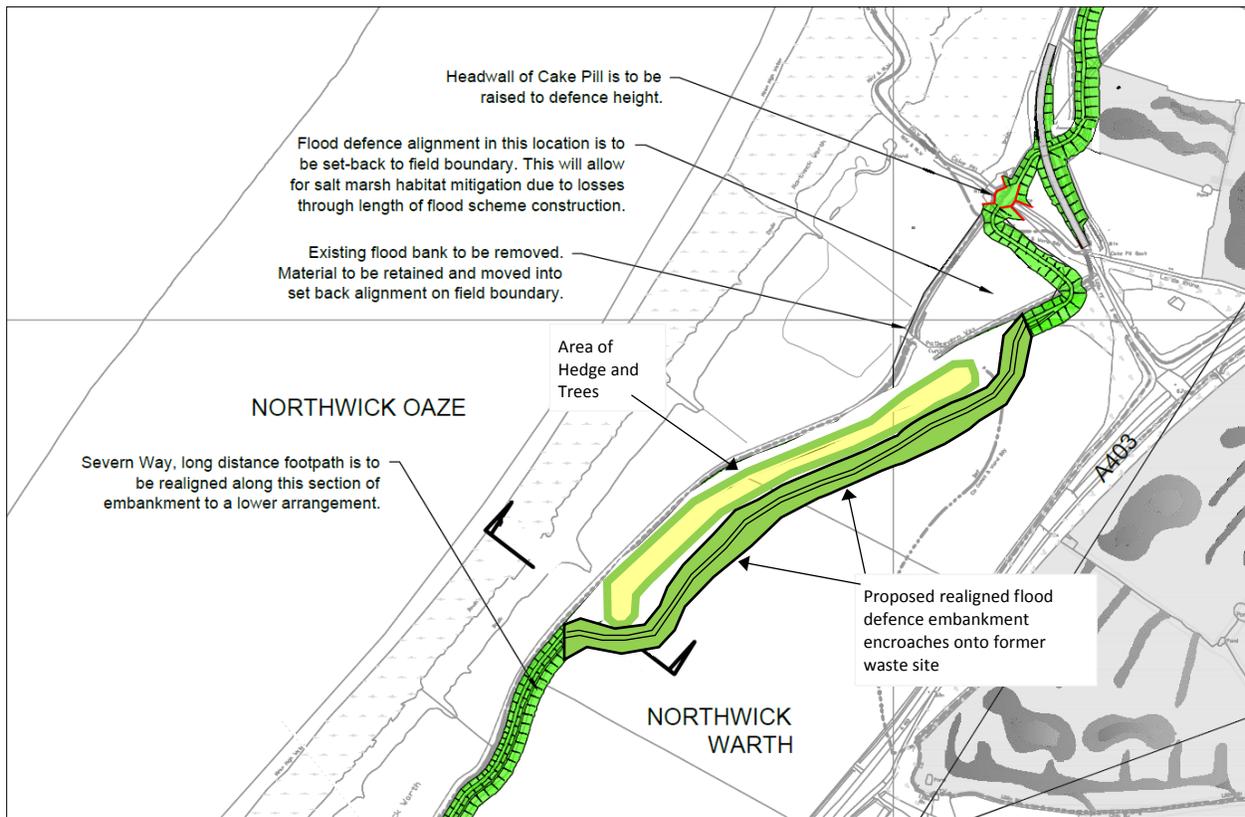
Plan of Alternative Flood Defence Embankment Encroaching into Former Waste Site
